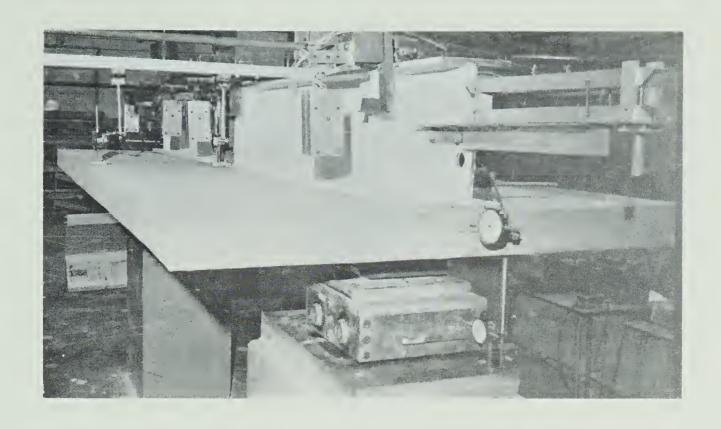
12WF31 SPECIMENS PRIOR TO CASTING
